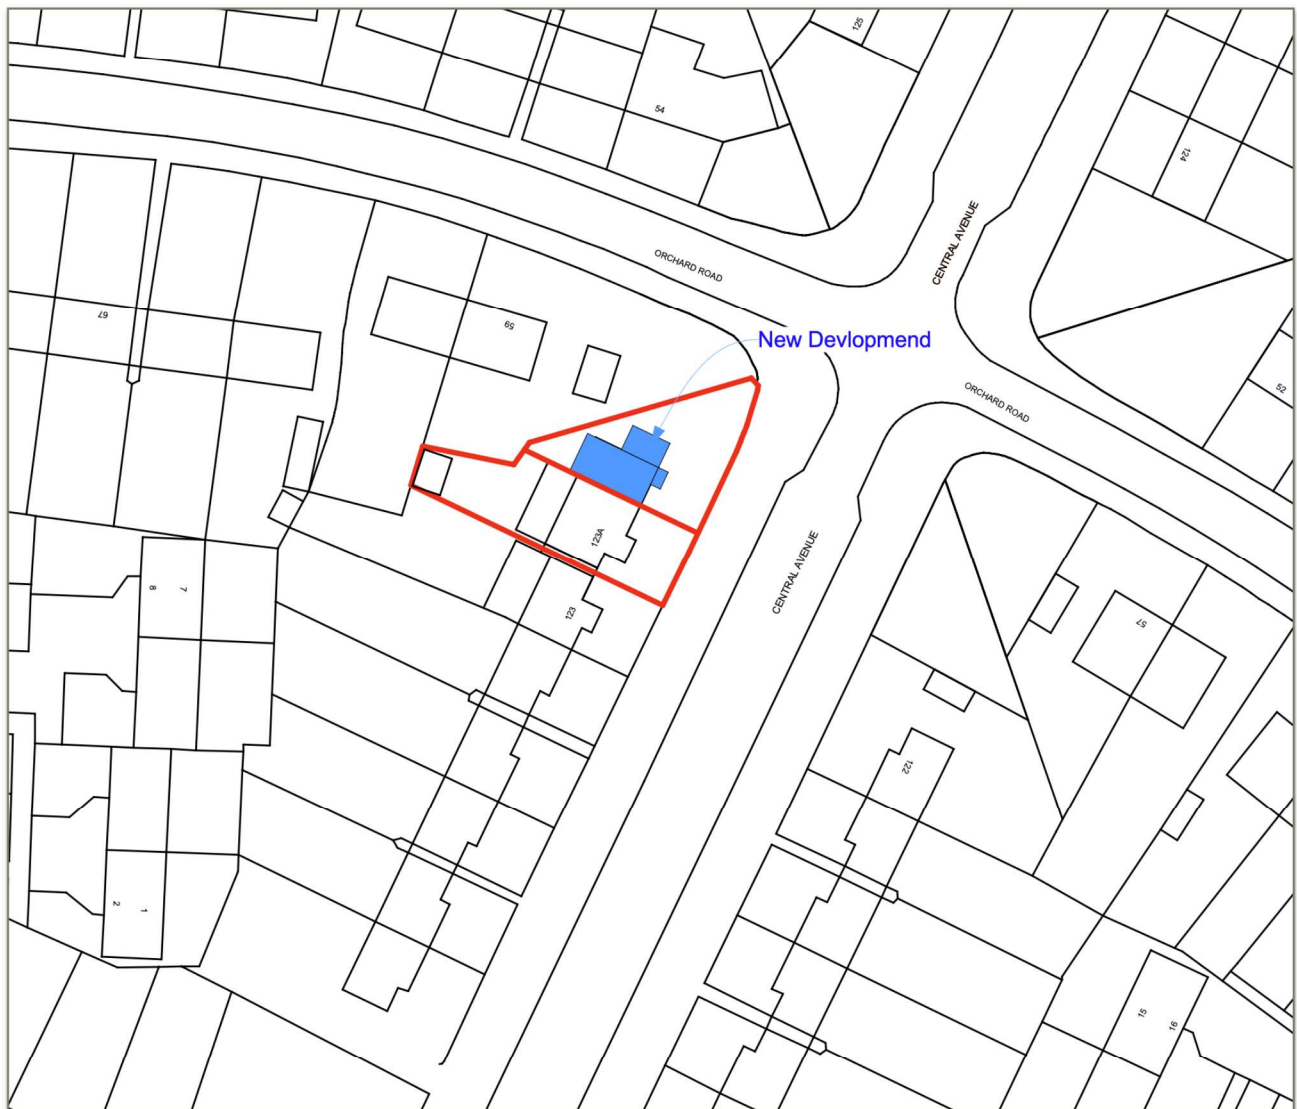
EXISTING SITE & PROPOSED BUILDING (HATCHED)
